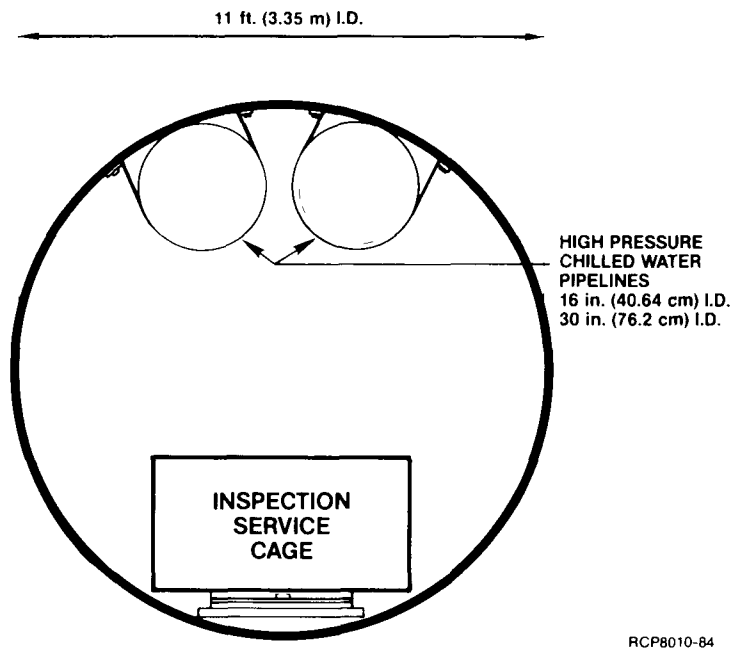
Shaft No. 3 Confinement Intake Shaft.
